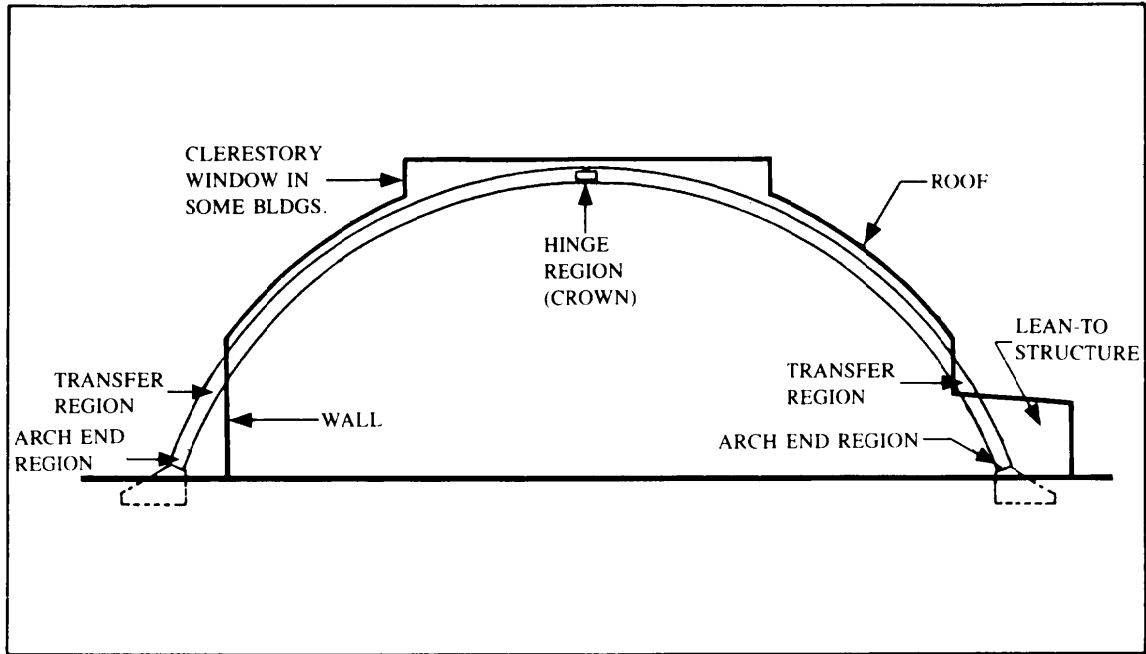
(Sketch) Elements of a three-hinged glulam arch and a commonly used roof system are shown in this schematic of a building cross section.
